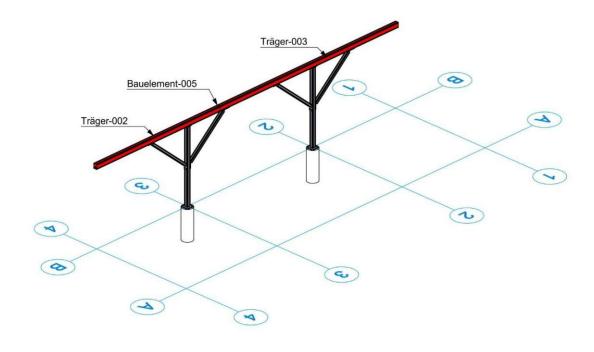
Step 7 - The pre-assembled beam, made of 3 elements, is placed on top of the columns and bracings
